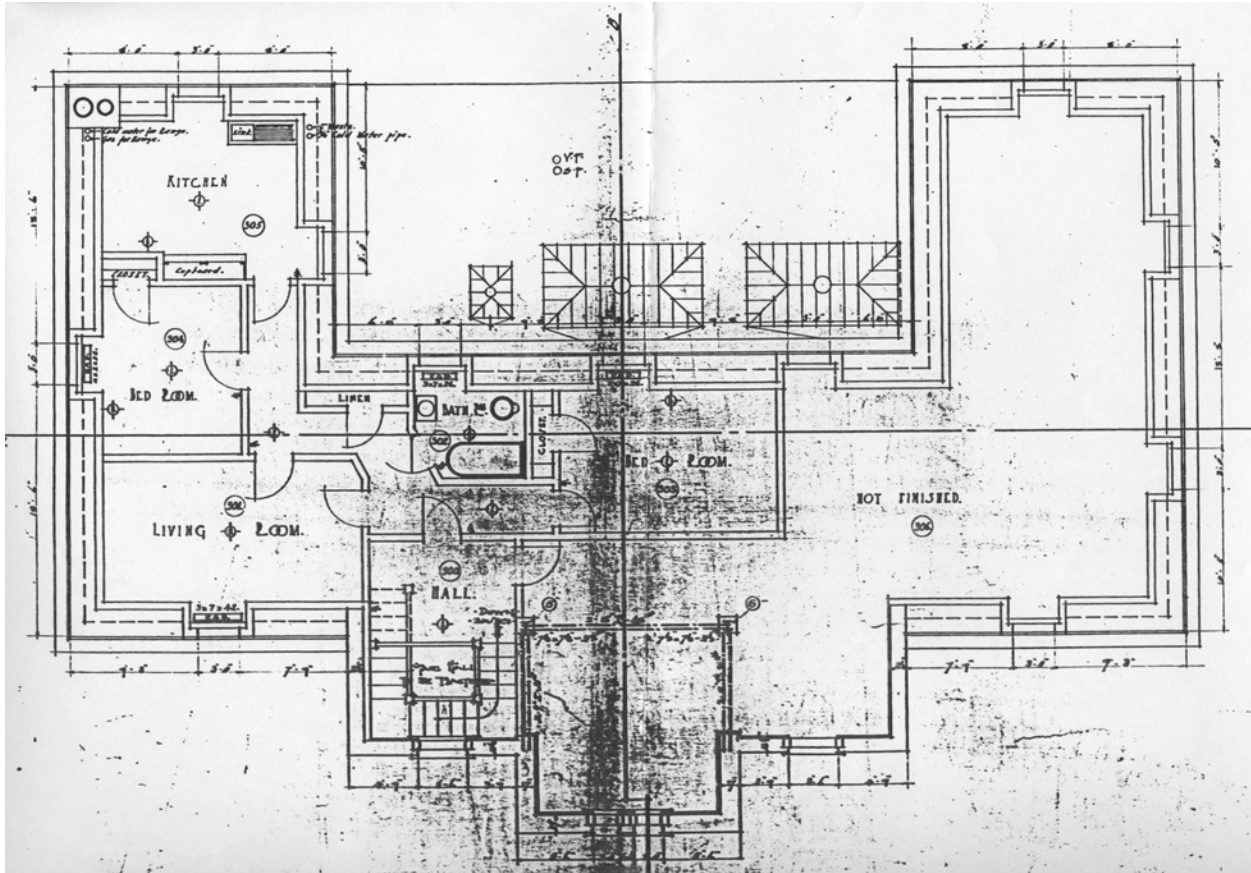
Drawing No. 4 (as revised in 1924): Third Floor Plan showing the layout of the caretaker's apartment, the staircase, and the area to remain unfinished on the west side of the building.
